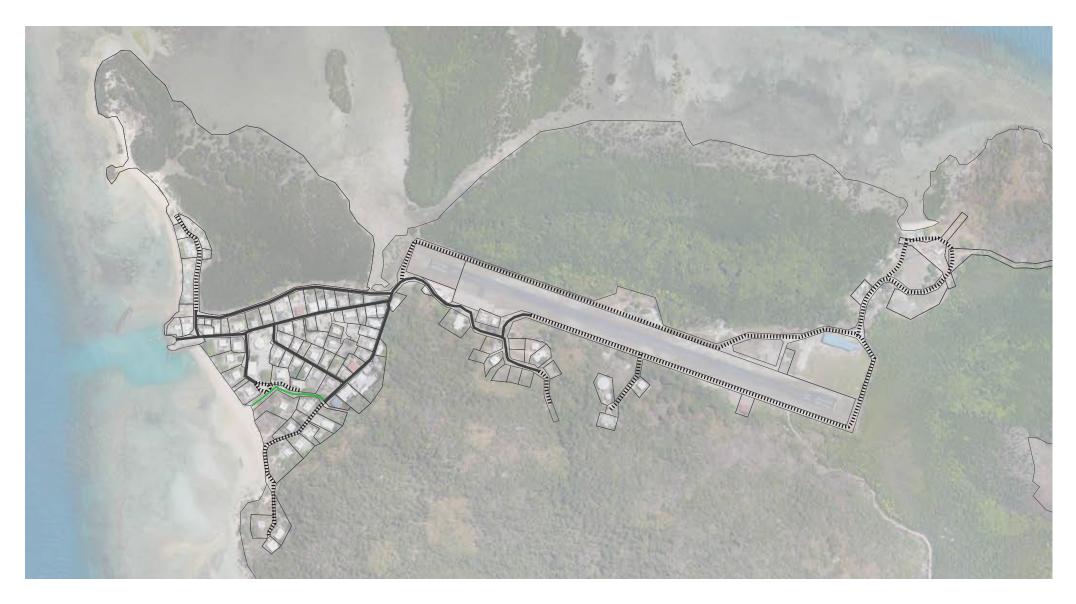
ROAD AND DRAINAGE INFRASTRUCTURE - EXISTING
